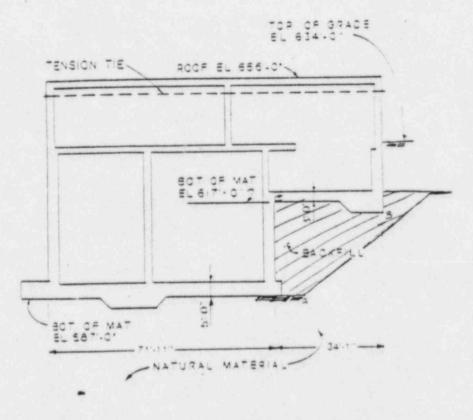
Typical section of service water pump structure (looking west) (from Applicant's Exh. 28 (corrections from the testimony)).
